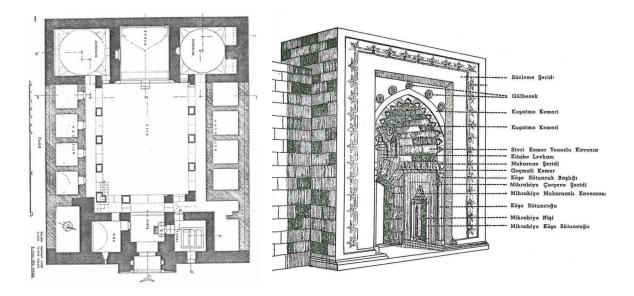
Sircali Madrasa Floorplan & Facade Visual (Cilasun, 2018)
